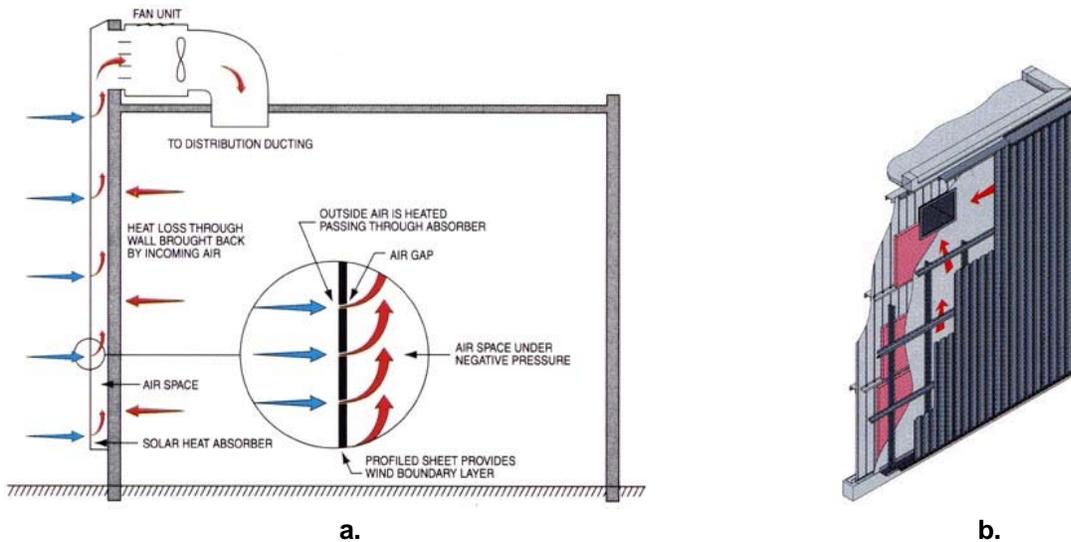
Schematic of air flows through (a) a solar wall and (b) typical installation.
